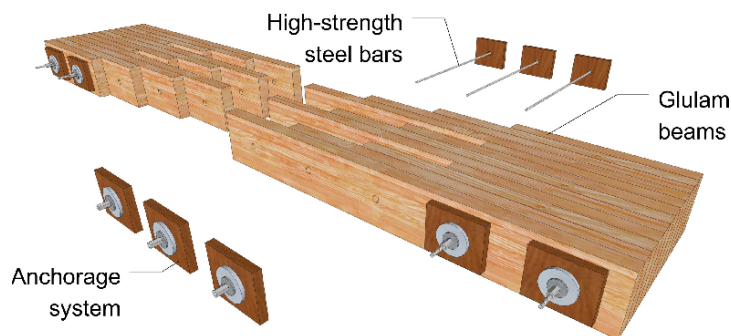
Build-up of SLT slab (Crocetti et al., 2016)
